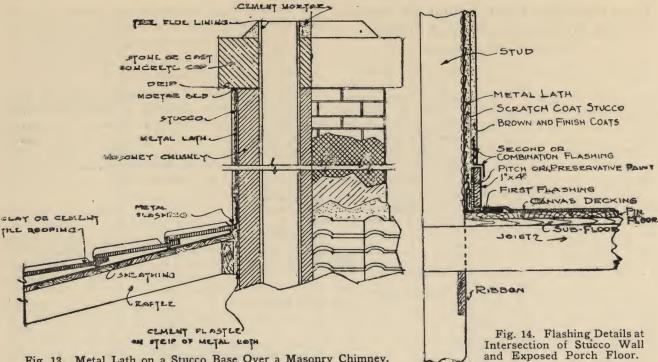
Metal Lath on a Stucco Base Over a Masonry Chimney.
